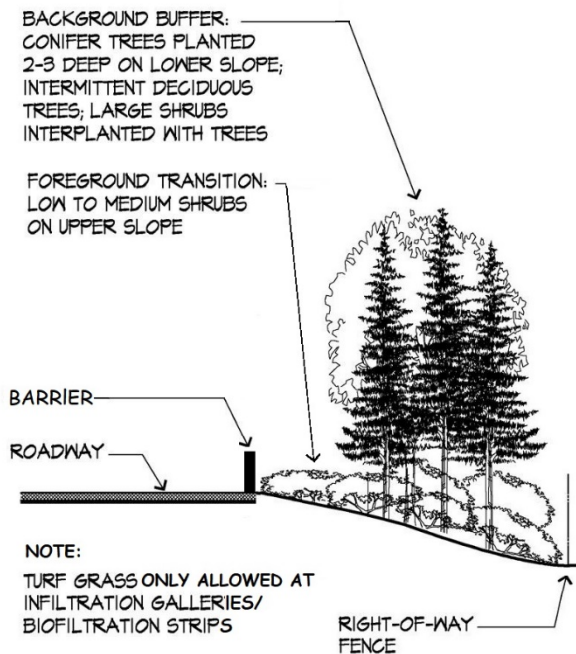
Roadside Planting on Fill Slope with Barrier or Guardrail.
